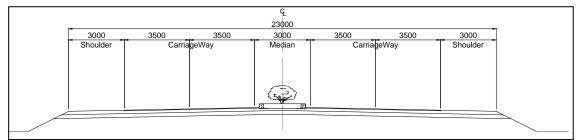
(a) Proposed Typical Cross Section (Rural Area)
